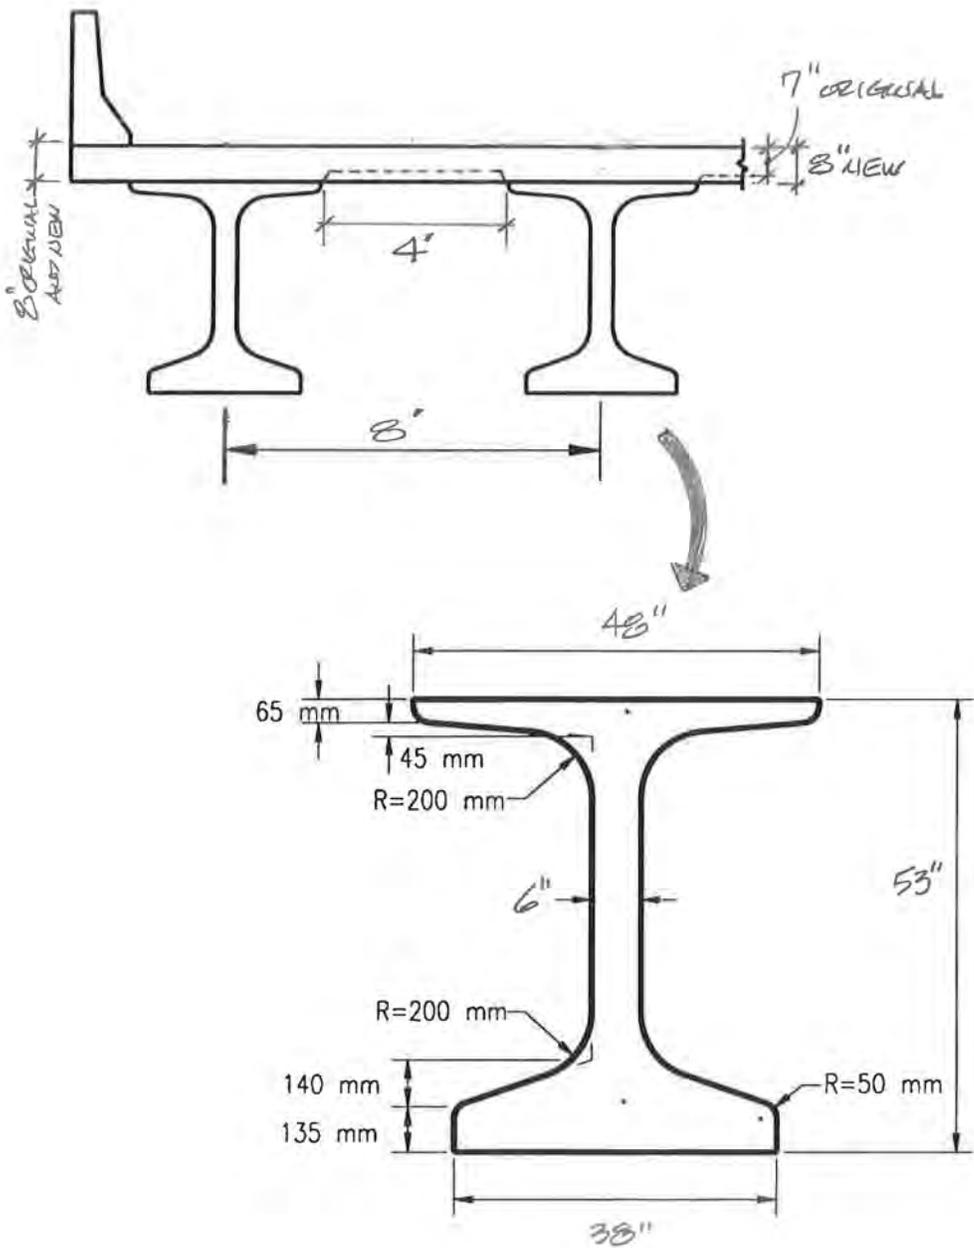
NU Bulb-Tee Girders for Example Bridge
